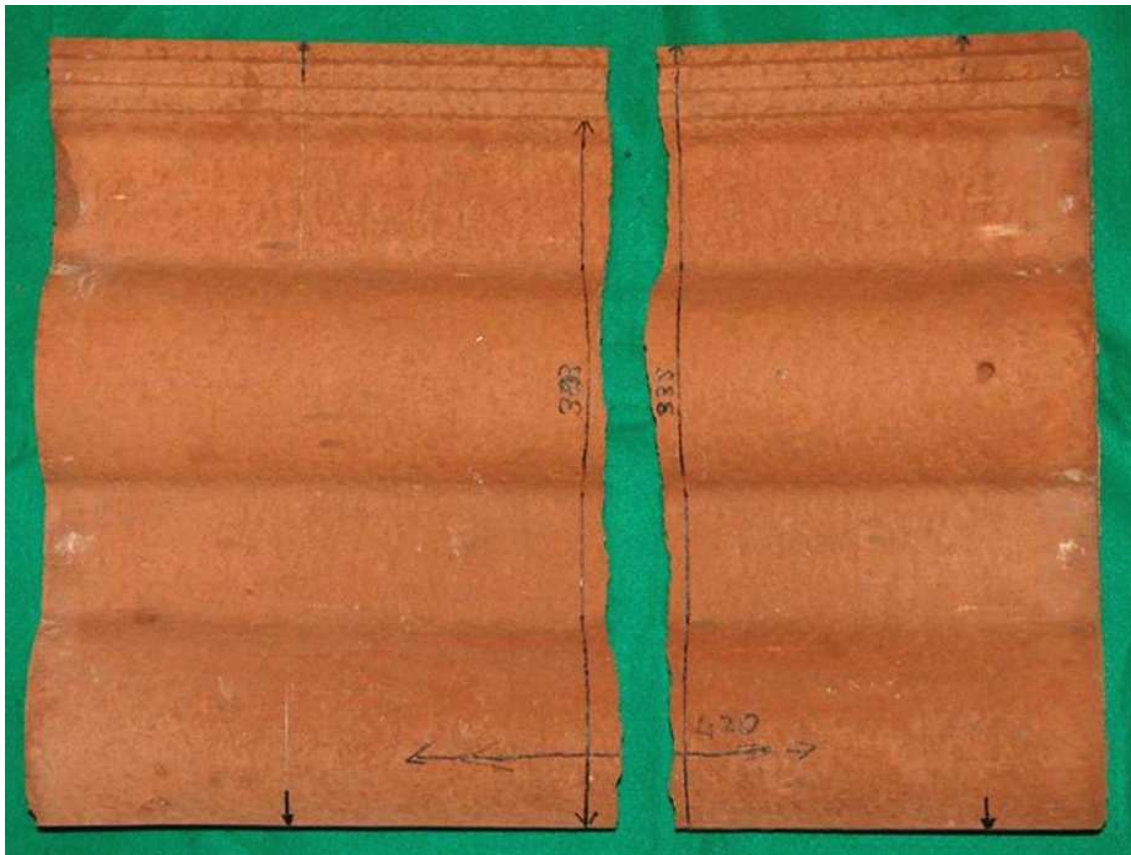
Typical concrete tile sample after testing. Note the transverse failure, without any visible plastic deformation.
